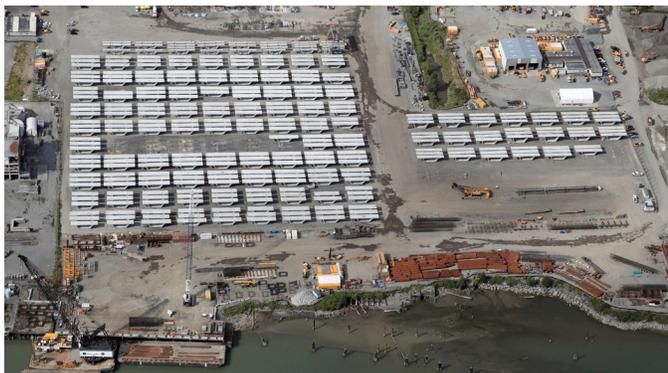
Match-casting the Port Mann Bridge segments at the off-site precast yard ensured strict geometry control, as it will at the Ship Channel Bridge.
